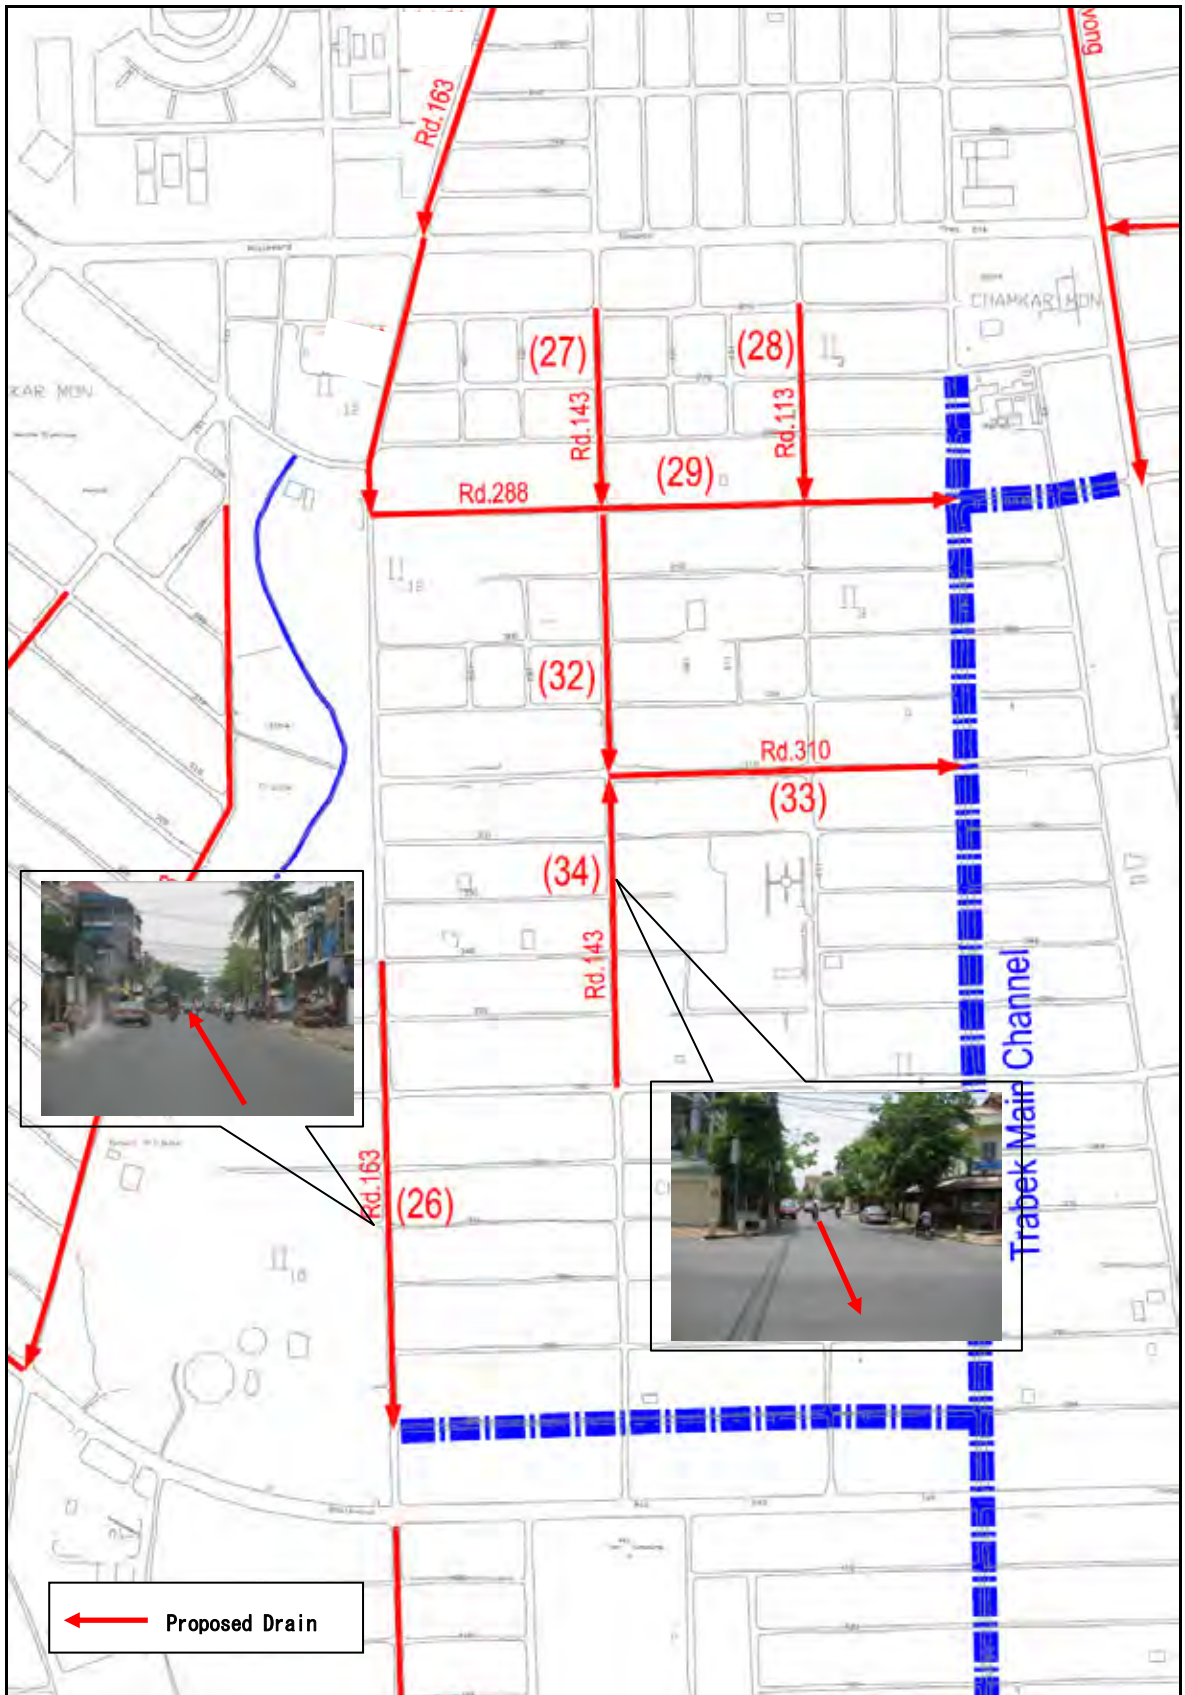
Alignment of Proposed Drainage Pipes (Tuol Sleng Area)
